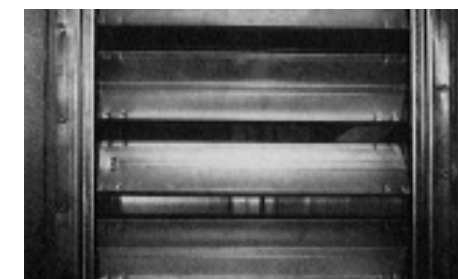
Be sure that damper blades open and close properly and have sufficient rotation clearance.
